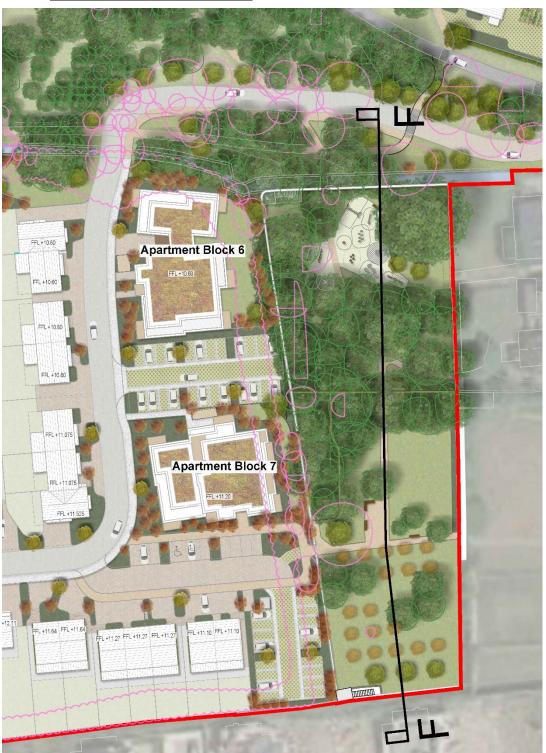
Landscape Plan - Character Area 5 - The Walled Garden
